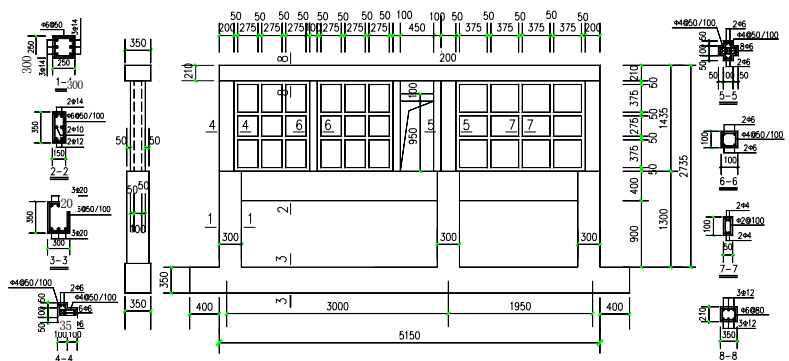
Geometry dimensions and reinforcement details of specimen KZML-3
